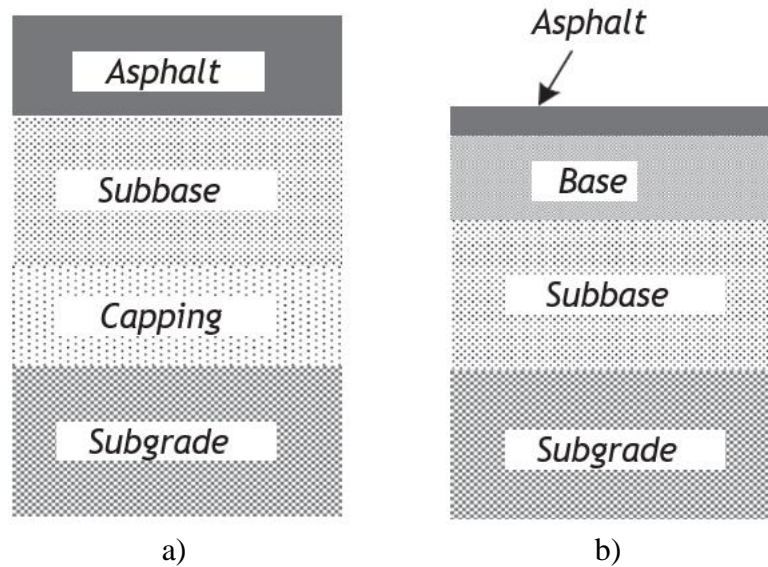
Flexible road structures typical of (a) highways and main roads; and (b) rural roads (Ravindra et. al, 2017)
